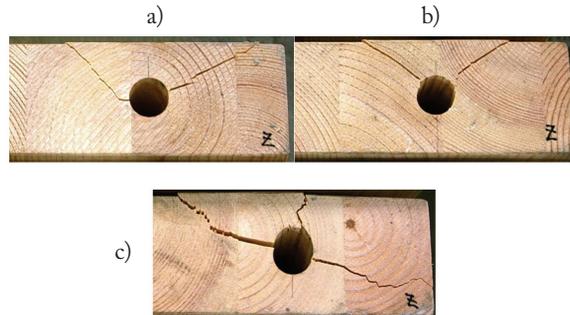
Detail of failures of the tested specimens at the place of steel support bar at the measuring point C for specimen ST2 a), ST3 b) and ST4 c).
